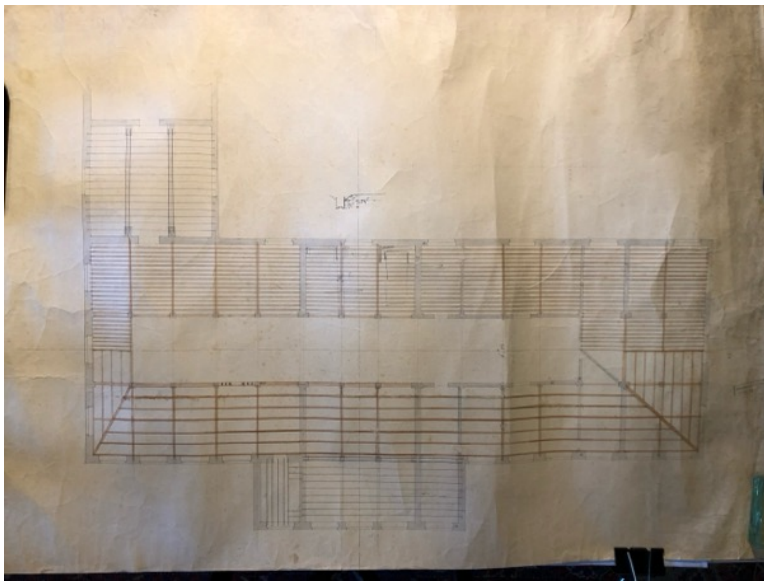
The original drawing of Vallaur's period showing the roof plan (source: IAM Archive, "59 G2/R4/27")
